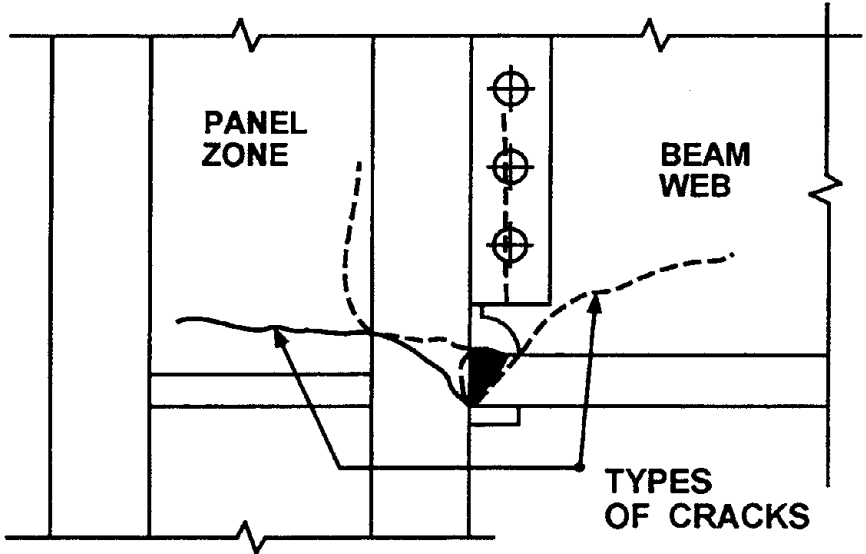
Some failure modes of the welded beam-to-column connection.
